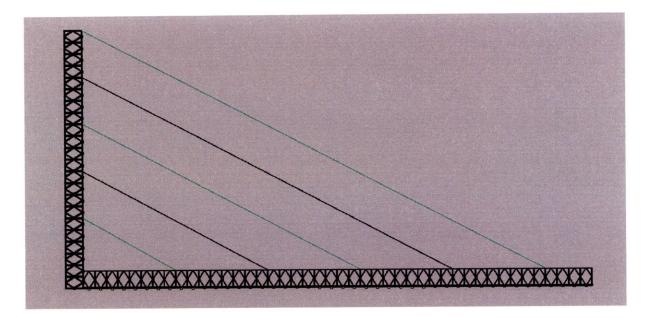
CABLES FOR 3 LANE AND 2 LANE BRIDGE FULLY INTERCHANGEABLE
